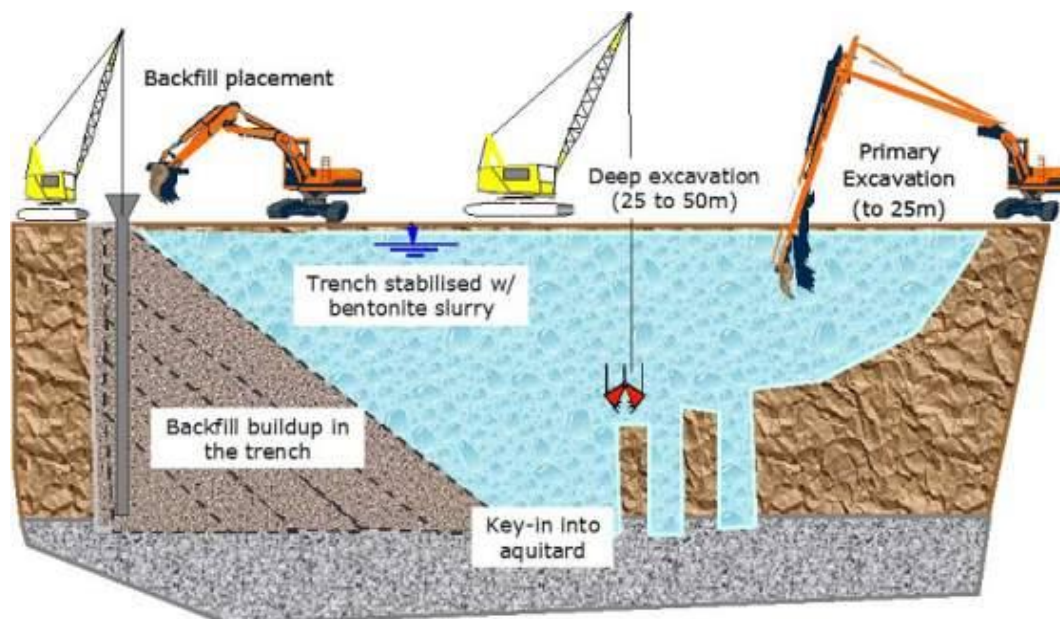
(Cross-alignment) generic sectional schematic of slurry wall construction techniques
